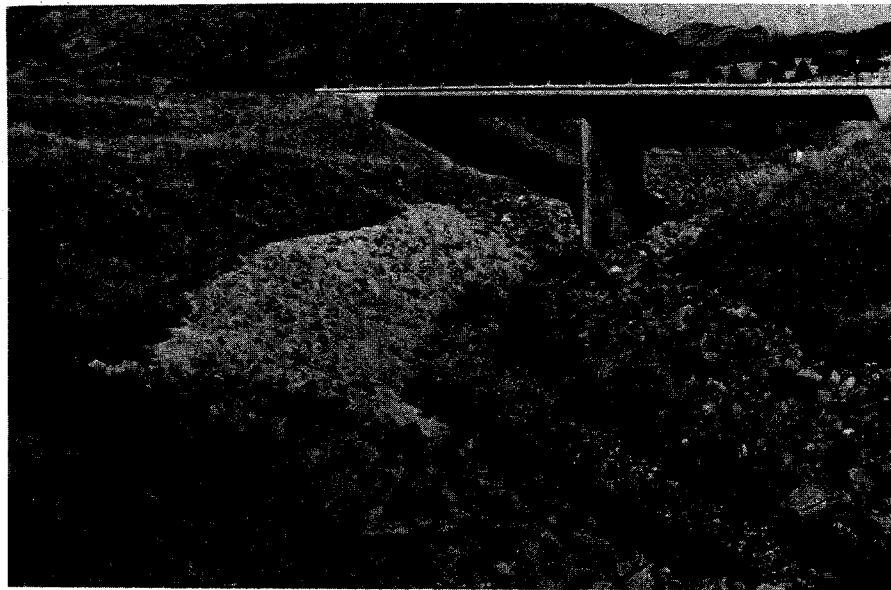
View upstream of channel bed and bank protection in 1976. Note grouted riprap on slope in foreground.
